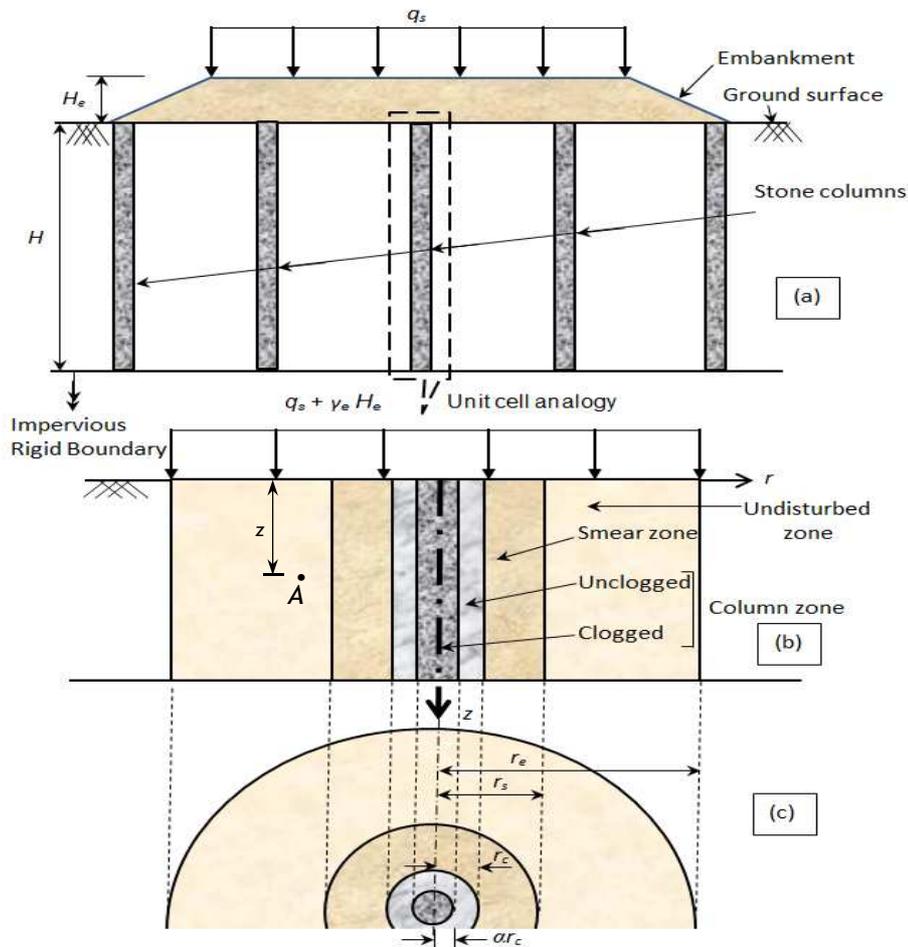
Soft clay reinforcement: (a) Embankment resting on stone column installed ground. (b) Unit cell analogy. (c) Cross section of unit cell.
